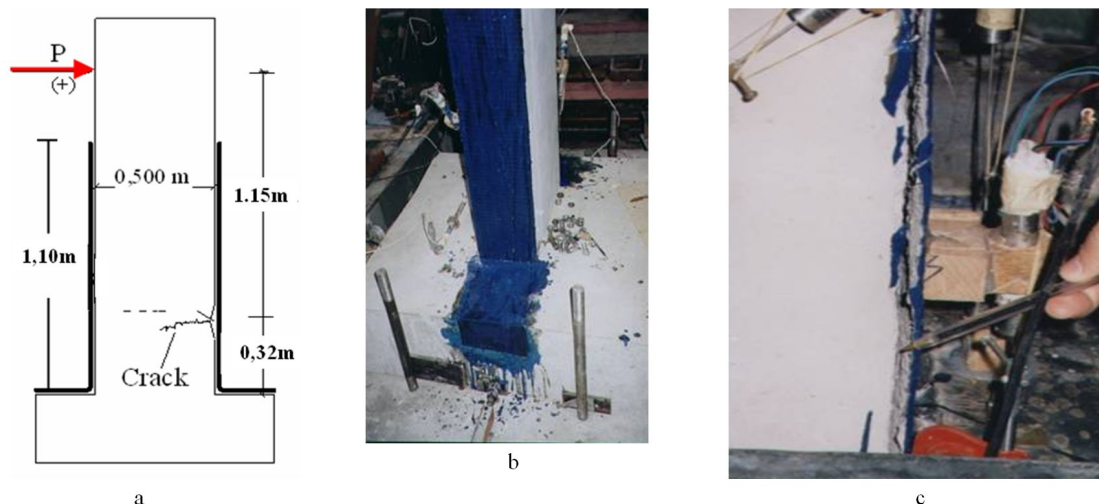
Specimen Rep-1 Pier A. Specimen 39b Rep-1 Pier A, attachment of CFRP layers. 39c Debonding of the CFRP layers from the right side of the repaired specimen Rep-1 Pier A.
